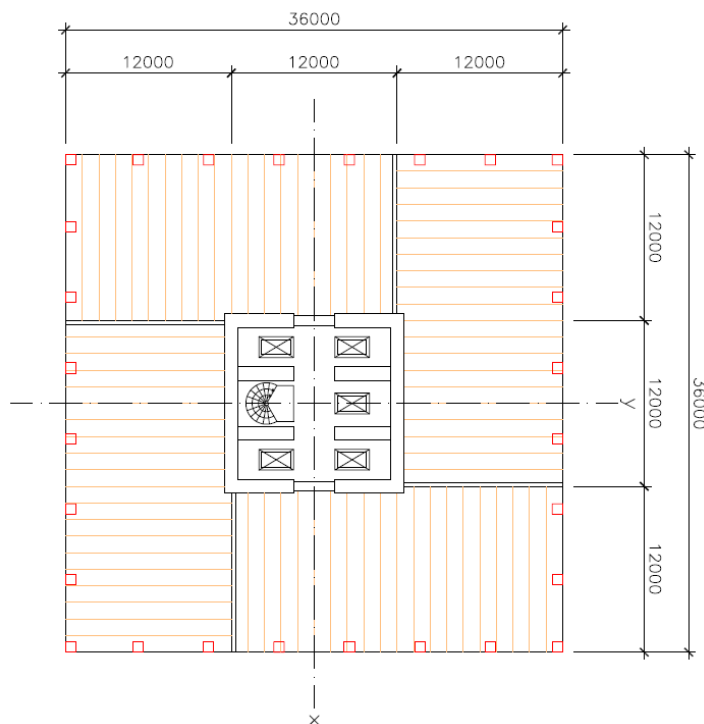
The load distribution depends on the arrangement of the floor system which consists of hollow core slabs.
